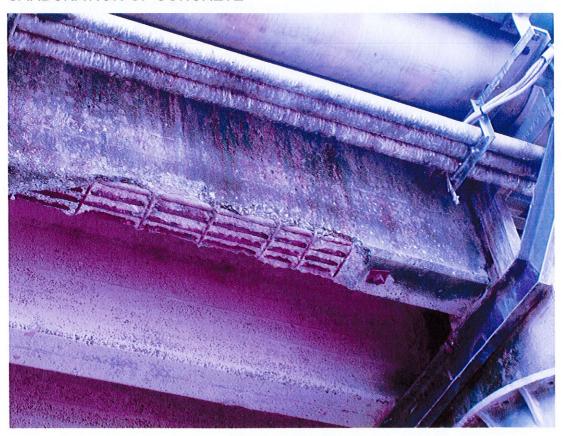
SPALLING ON DOWNSTREAM EDGE BEAM
